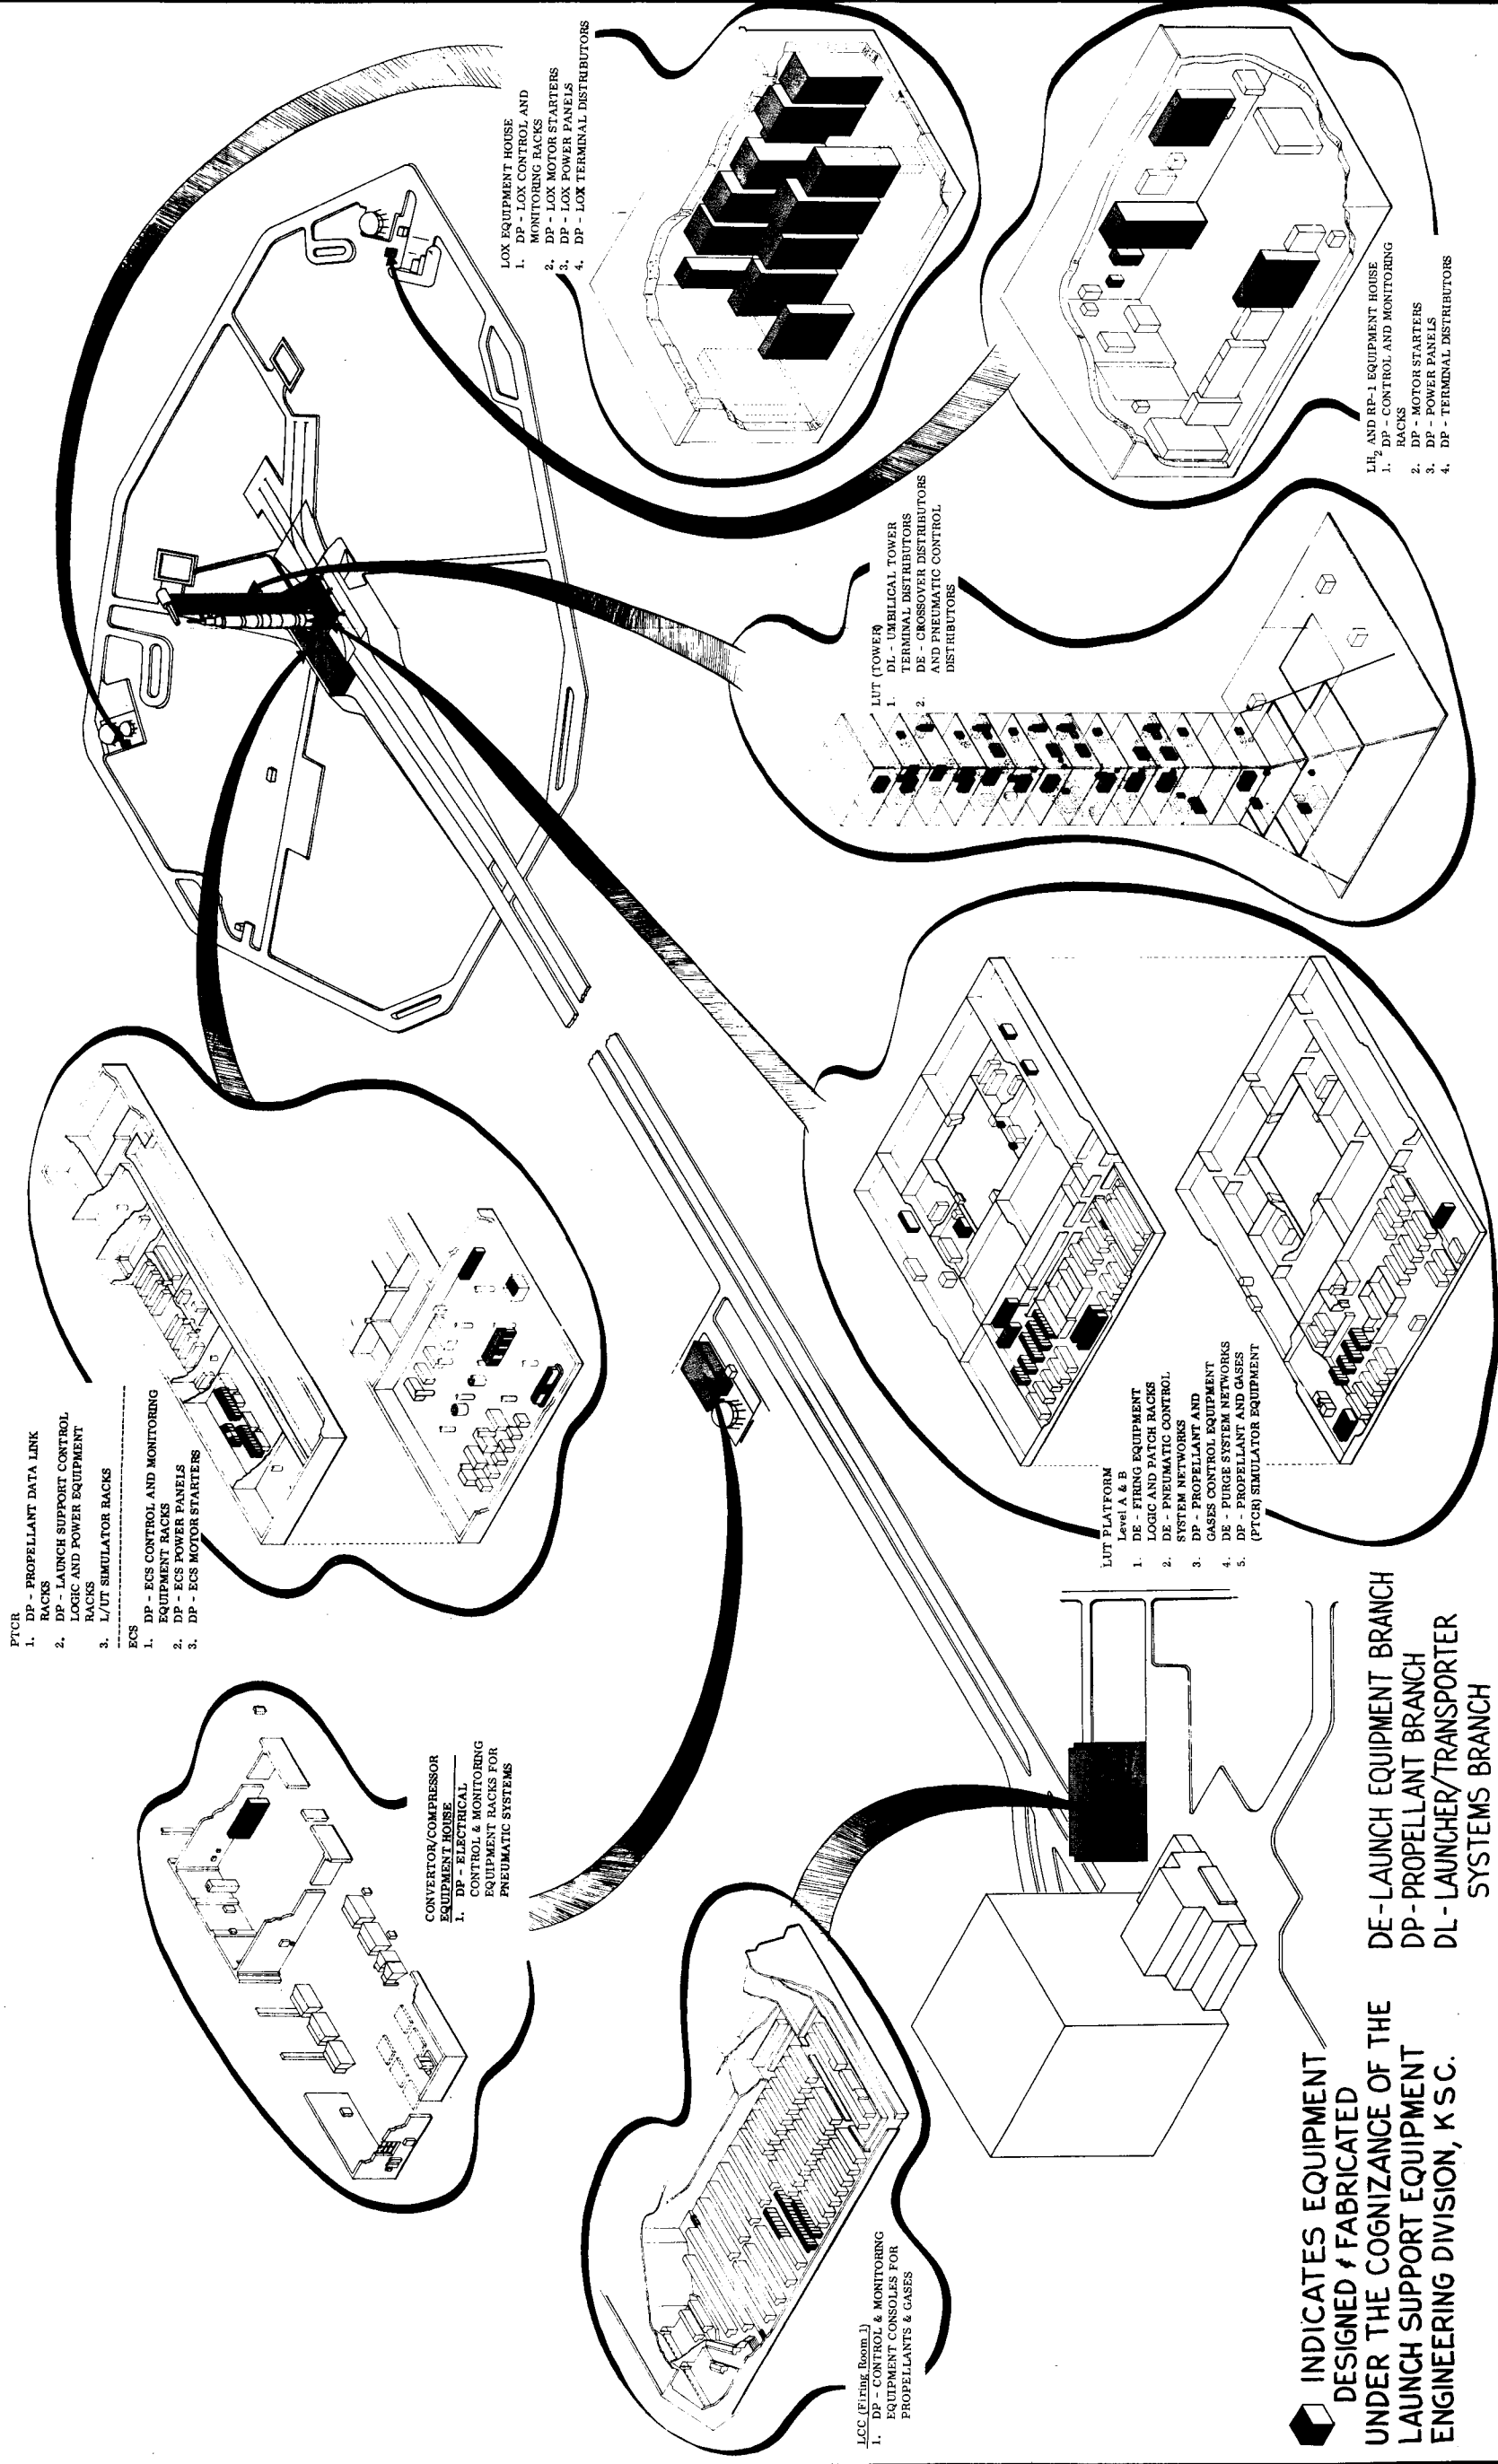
LC-39 Electrical Ground Support Equipment Rack Locations and Layout
